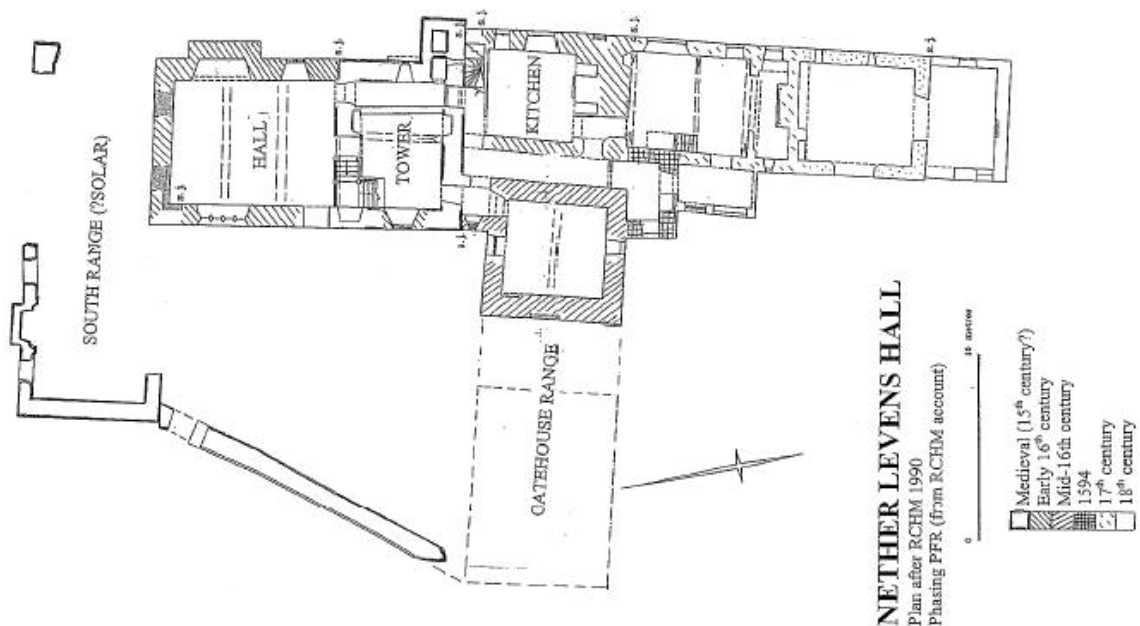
Plan showing the development of Nether Levens Hall (after Ryder 2002)
